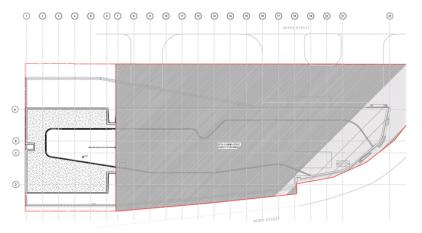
Proposed Roof Plan (showing 2-8 Sarah Street hatched in grey)
